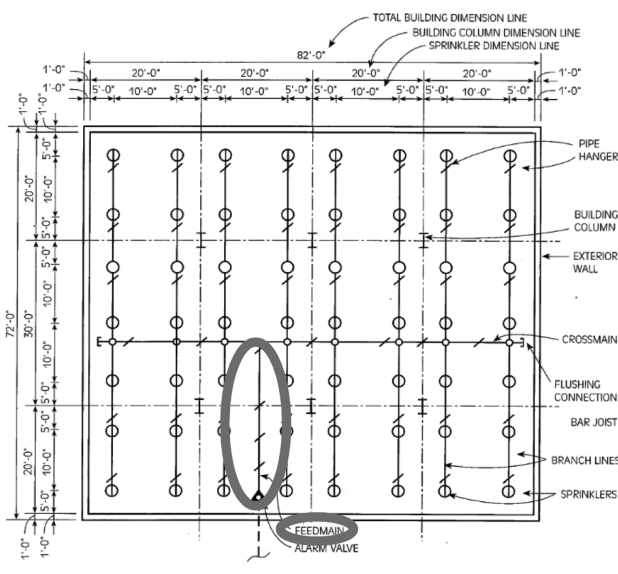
Plan view showing dimensioning guidelines for a sprinkler system. Sprinkler branch lines always run perpendicular to bar joists.
